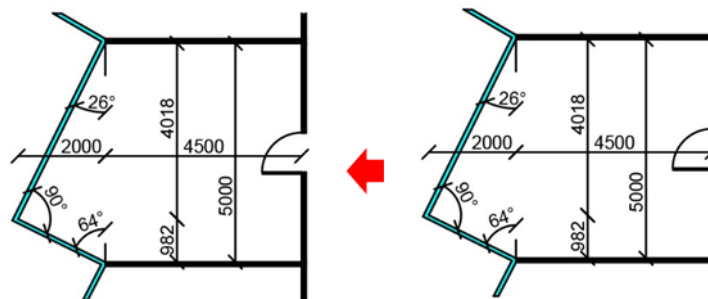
Two renovated multi-angled façade with different solar shading systems of the window facing southwest.
